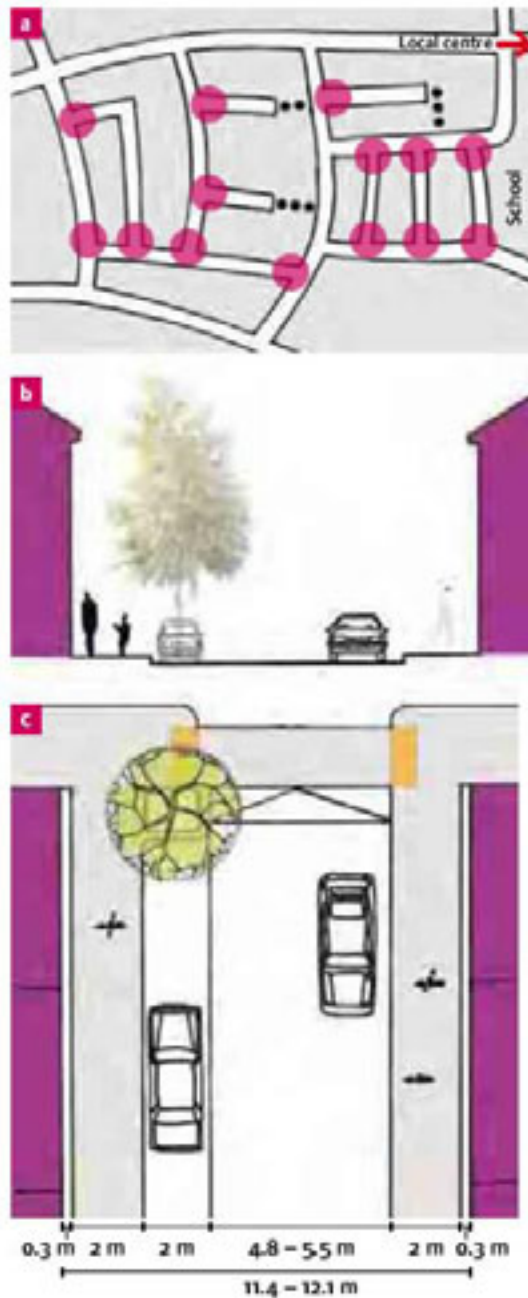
Typical representation of a street character type. This example shows the detail for minor side street junctions. Key plan (a) shows the locations, (b) is a cross-section and (c) the plan.
